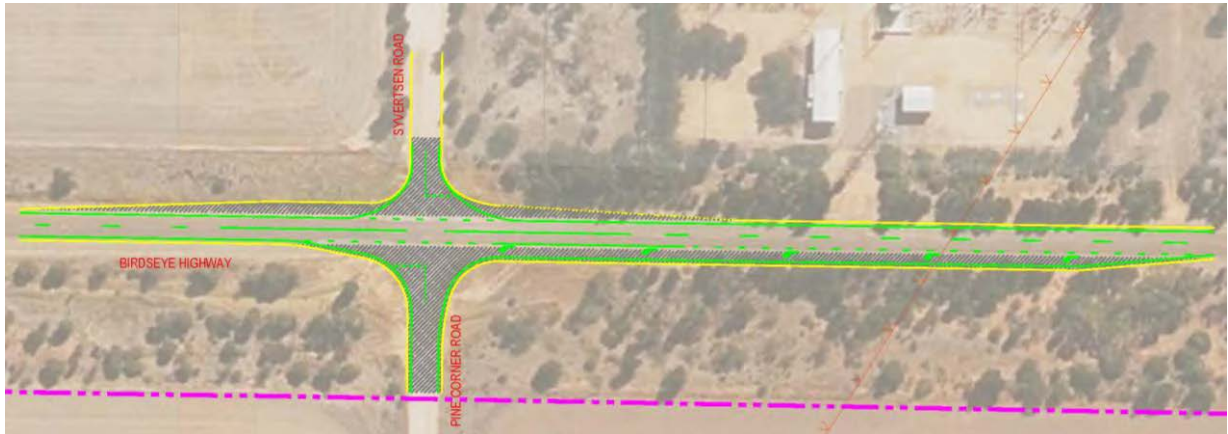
Proposed upgrade of Birdseye Highway/Pine Corner Road intersection.
